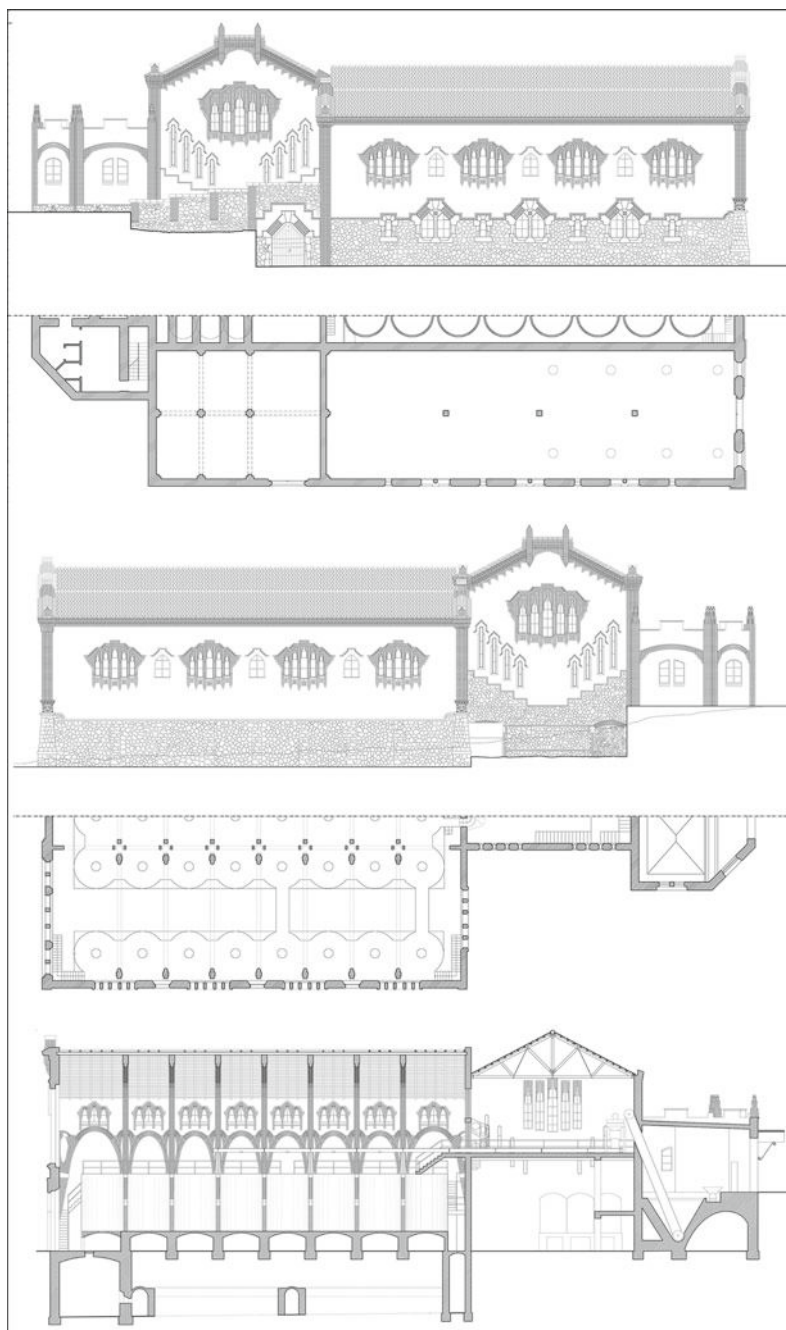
Pinell de Brai: side elevations and longitudinal section
